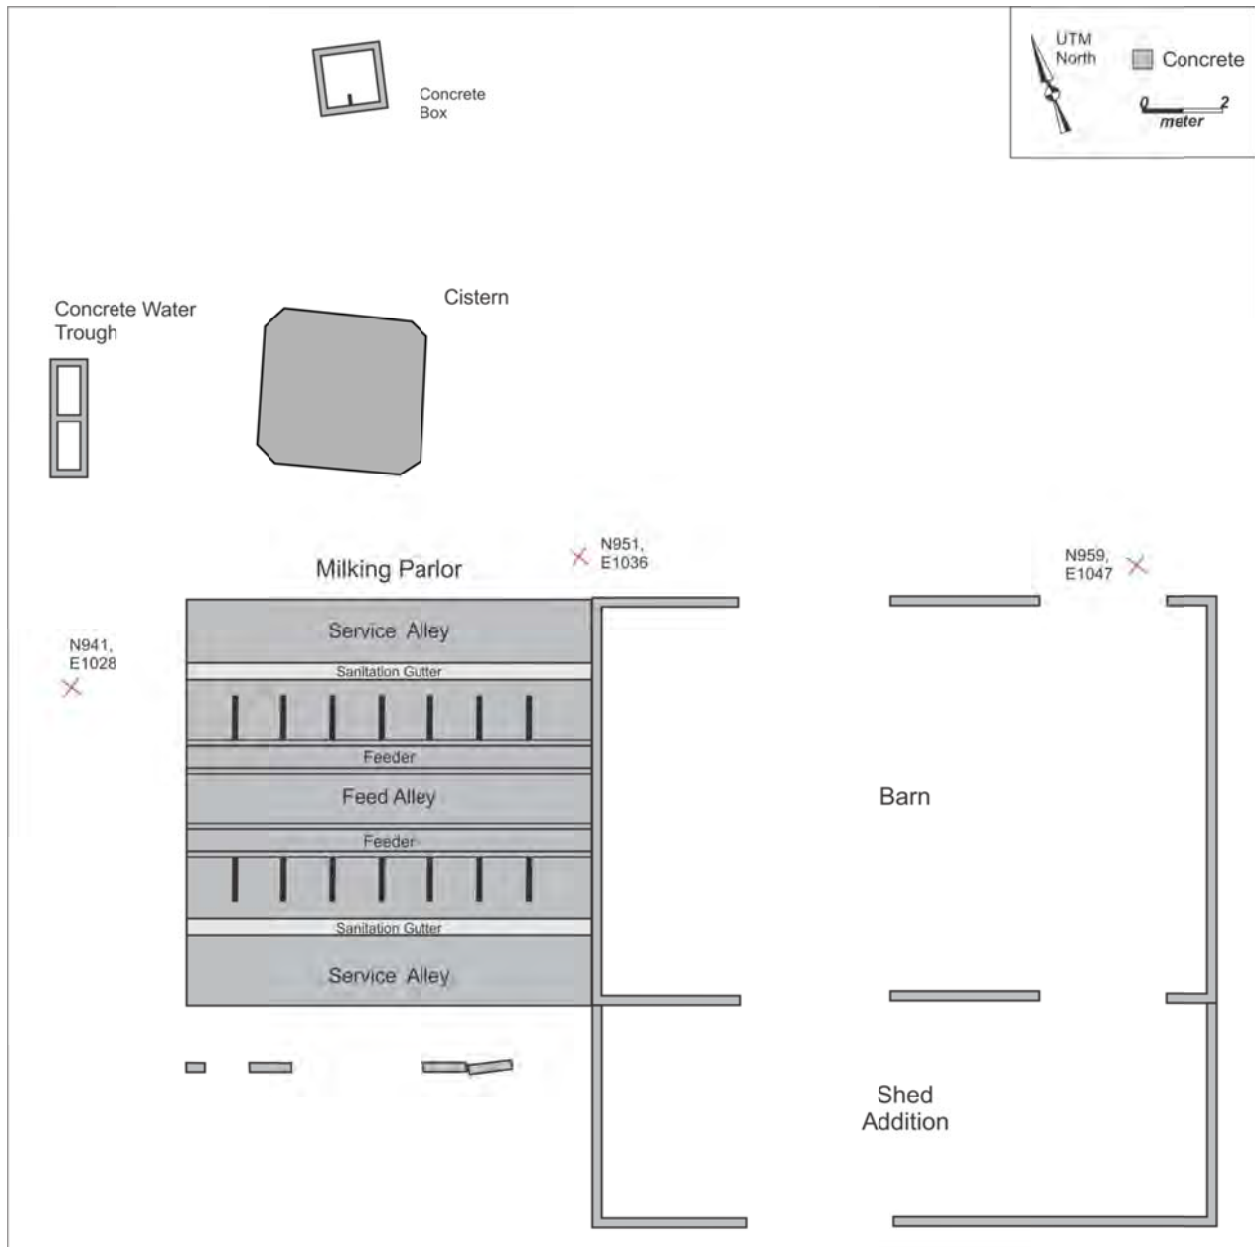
Illustration of the dairy barn (Structure #4) foundation and water system at Stockdale Road Dairy.
